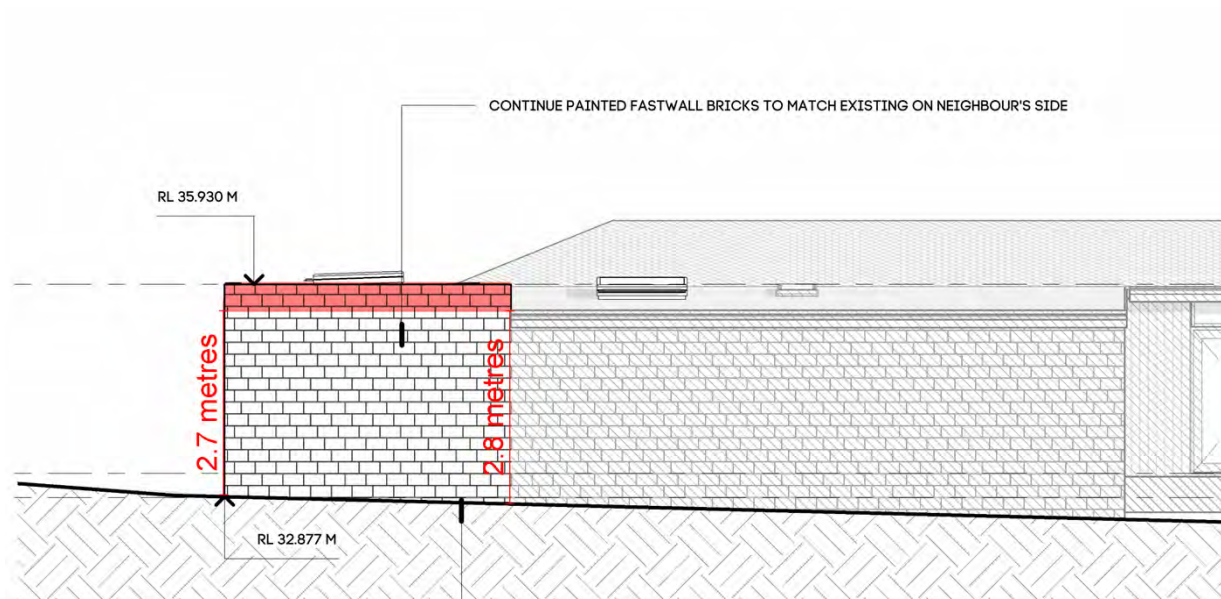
Portion of reduced southern boundary wall height in amended plans (highlighted red)
